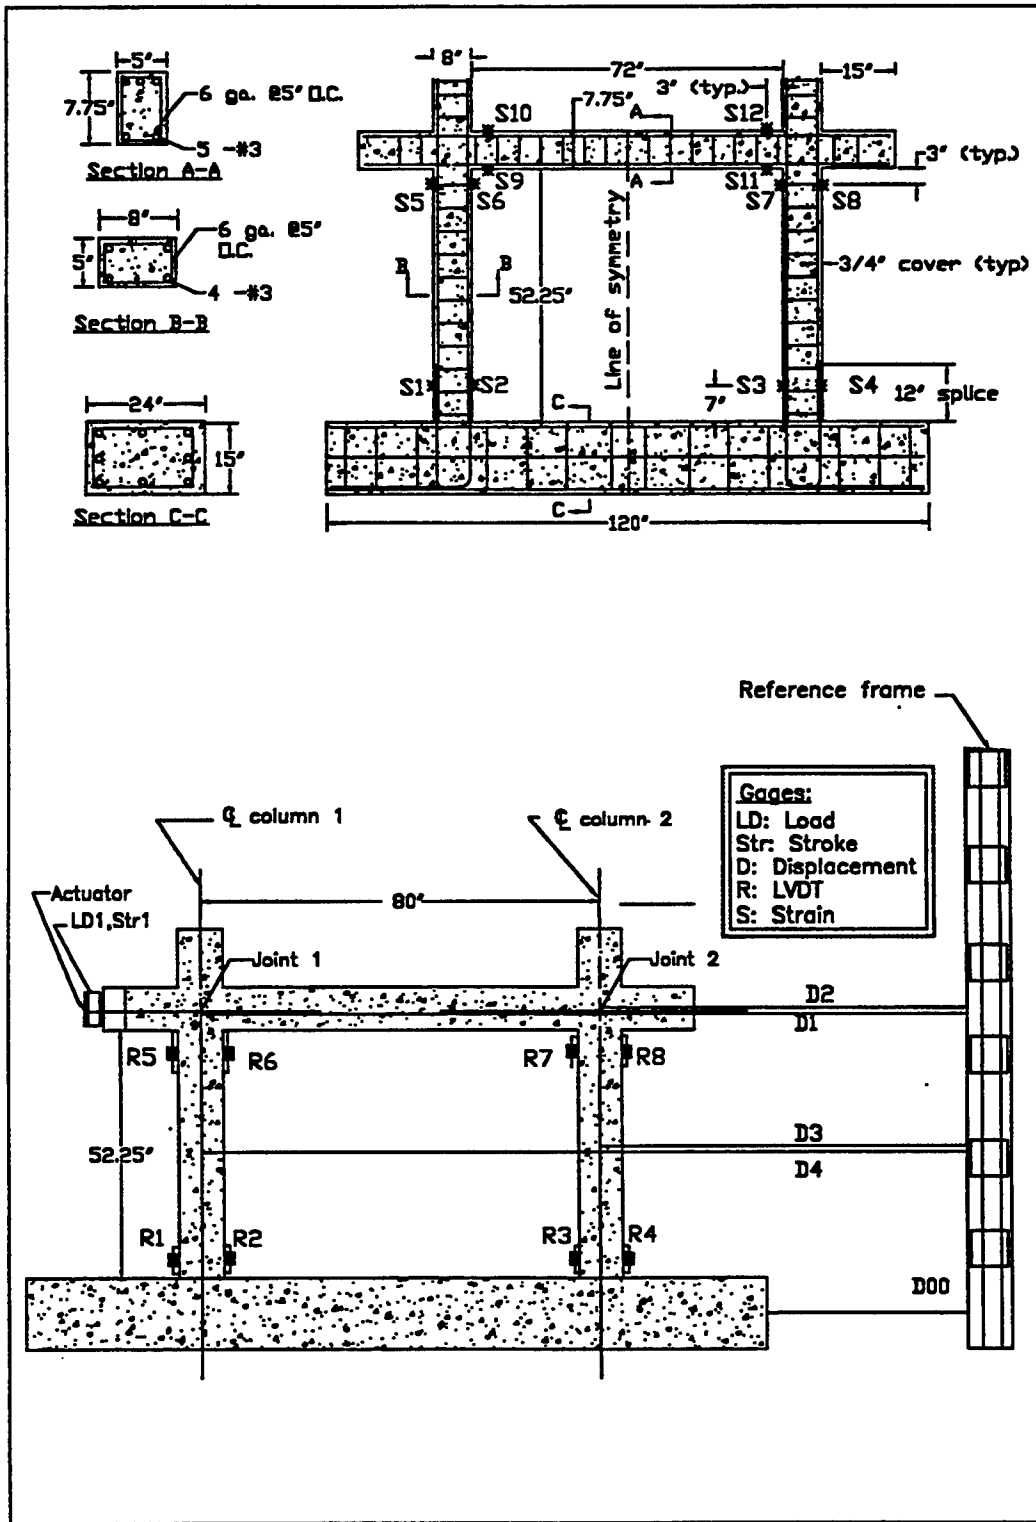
Reinforcement Details and Instrumentation Plan for the Bare Frame Specimen (Model 1)
